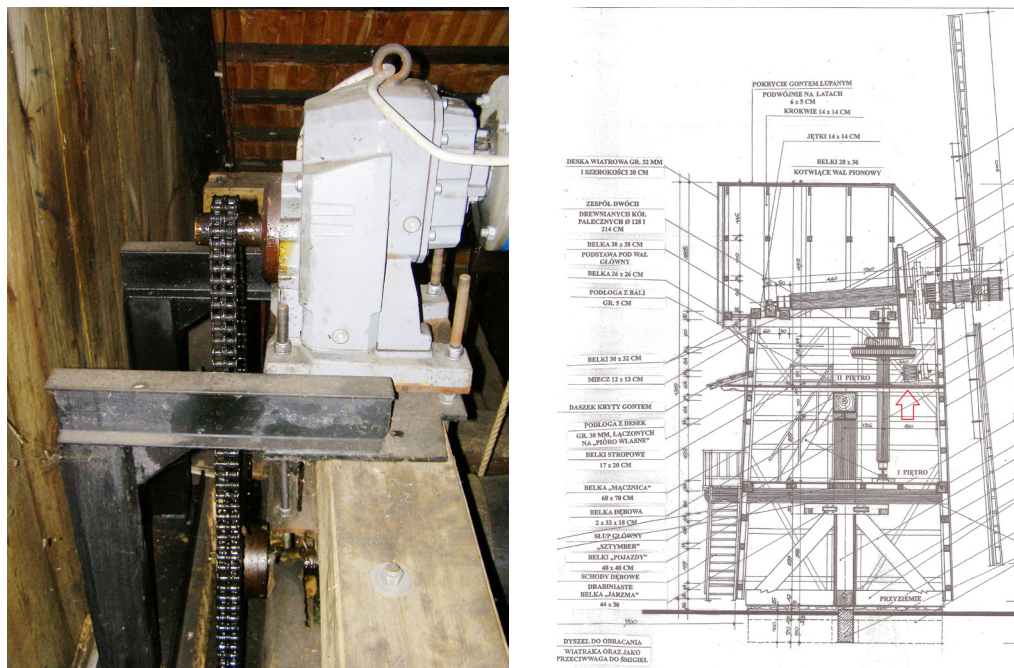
An electric motor with a gear motor in a windmill from *Grzawa*; photo by F. Tomaszewski, August 2022.
